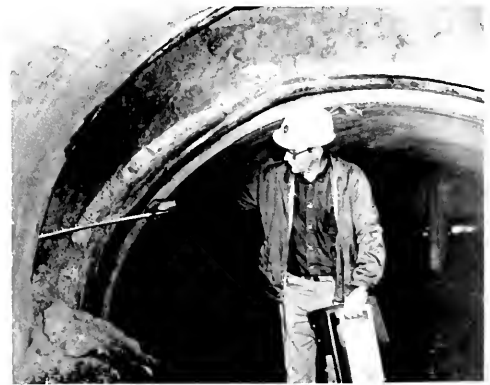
Joseph Jensen Filtration Plant, reservoir 96-inch diameter overflow pipe. First pipe joint from east end separated about 2 feet in offset. Metropolitan Water District photo.
